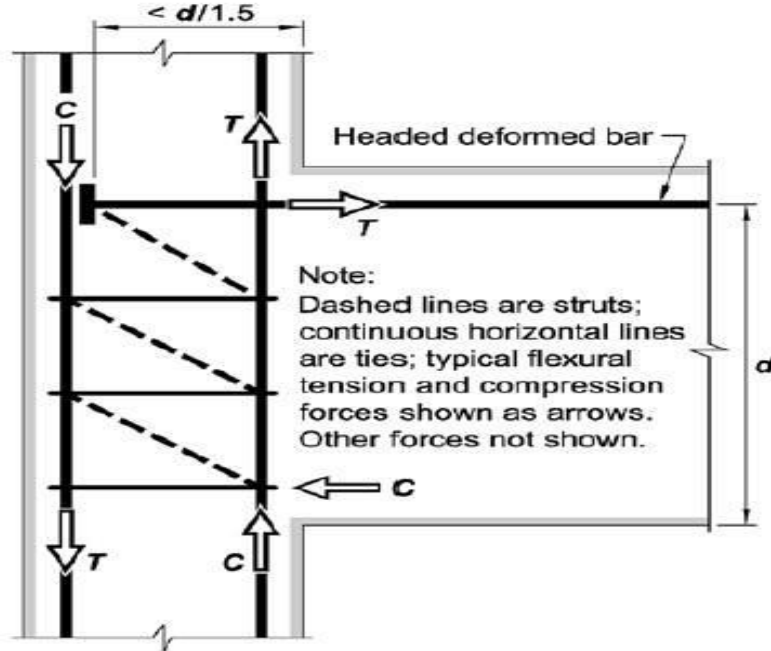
Breakout failure precluded in joint by providing transverse reinforcement to enable a strut-and-tie mechanism.
